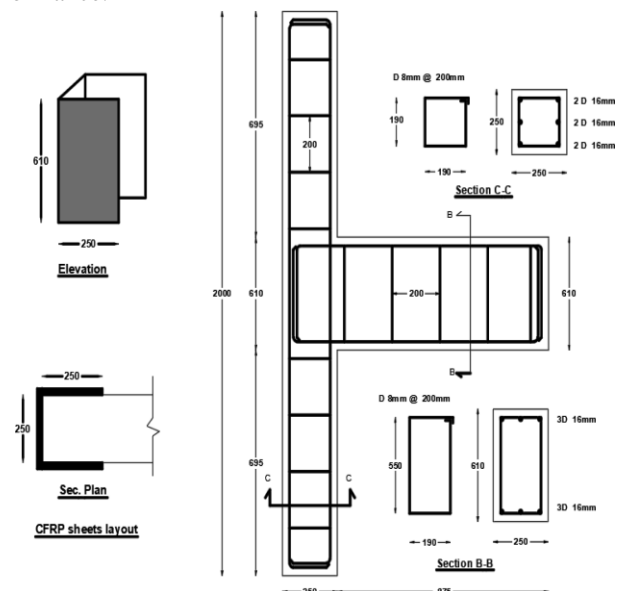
Details of the specimen: Reinforcement, dimensions, and arrangement of CFRP [13], all dimensions in mm.
